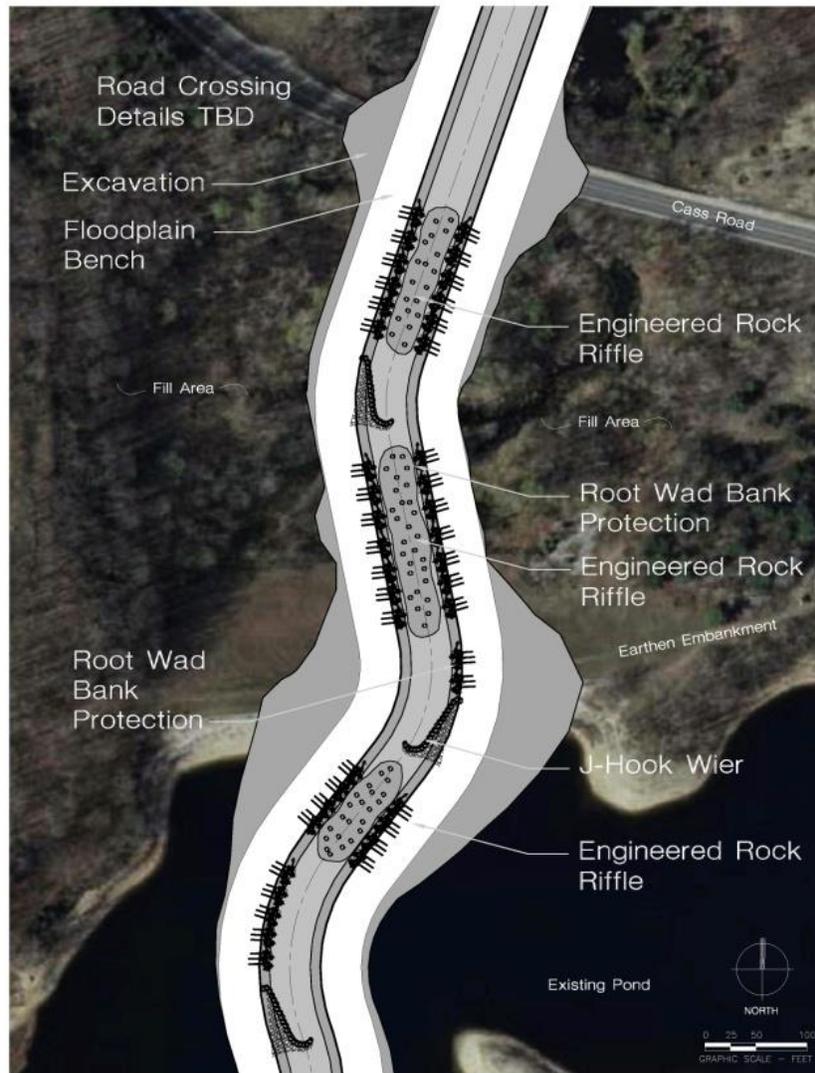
Application of Engineered Riffles and Bank Stabilization Measures
